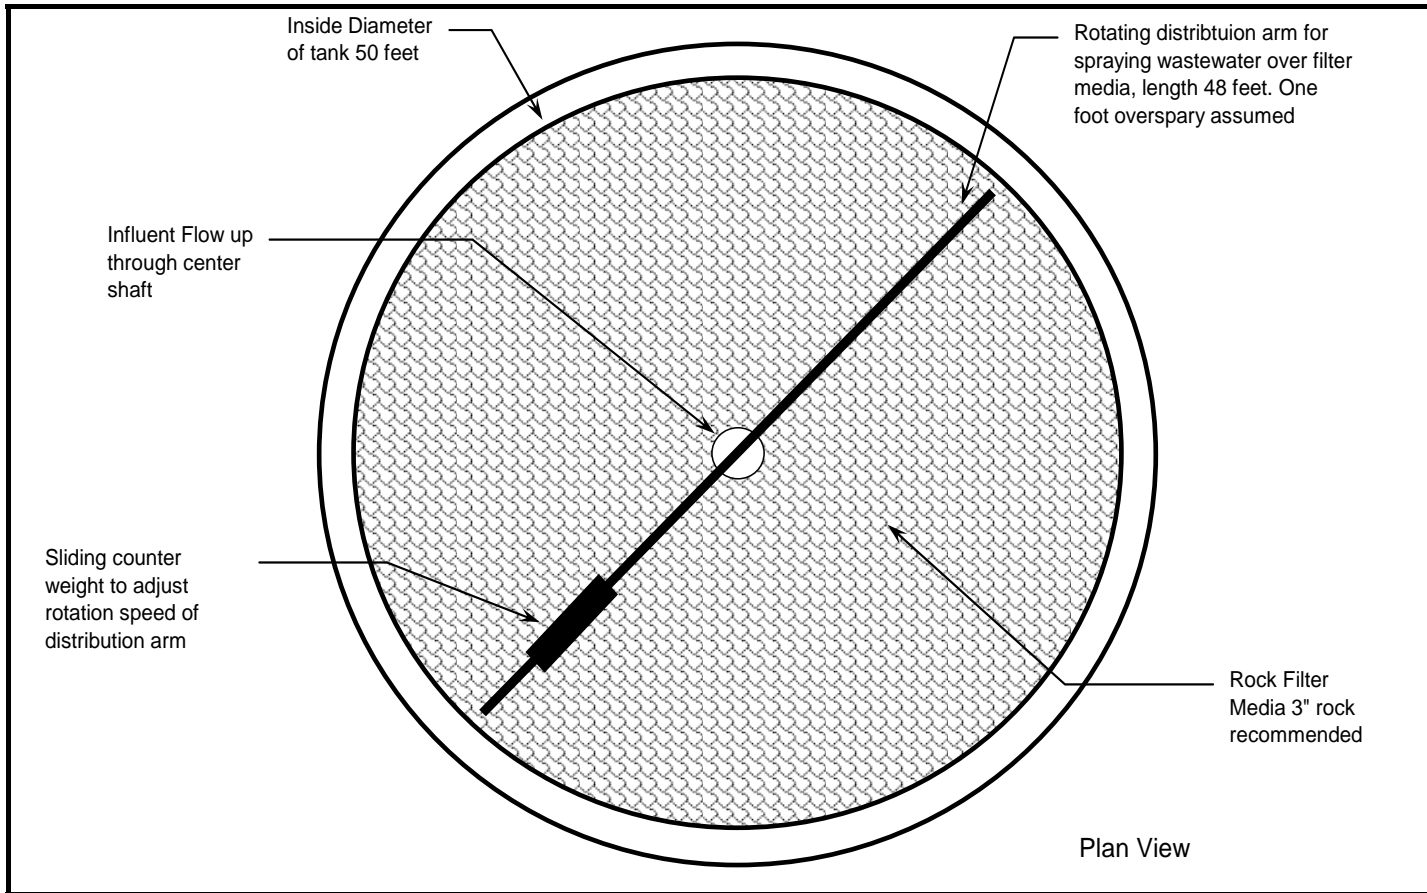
Plan View of Preliminary Design for Las Vegas Trickling Filter
